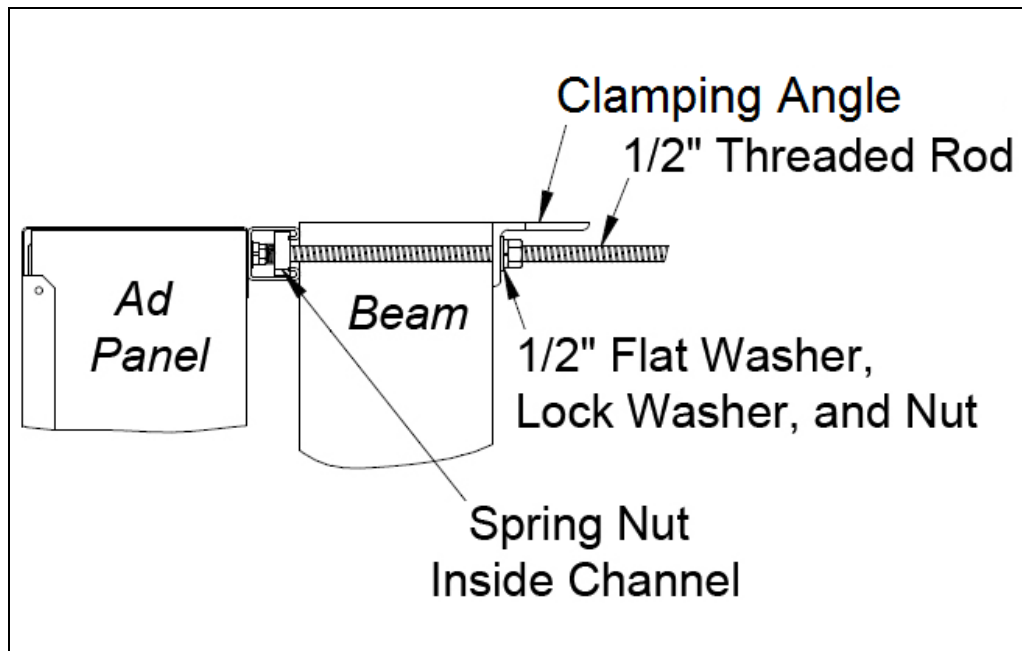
Ad Panel Mounting with Clamping Angles, Side View
